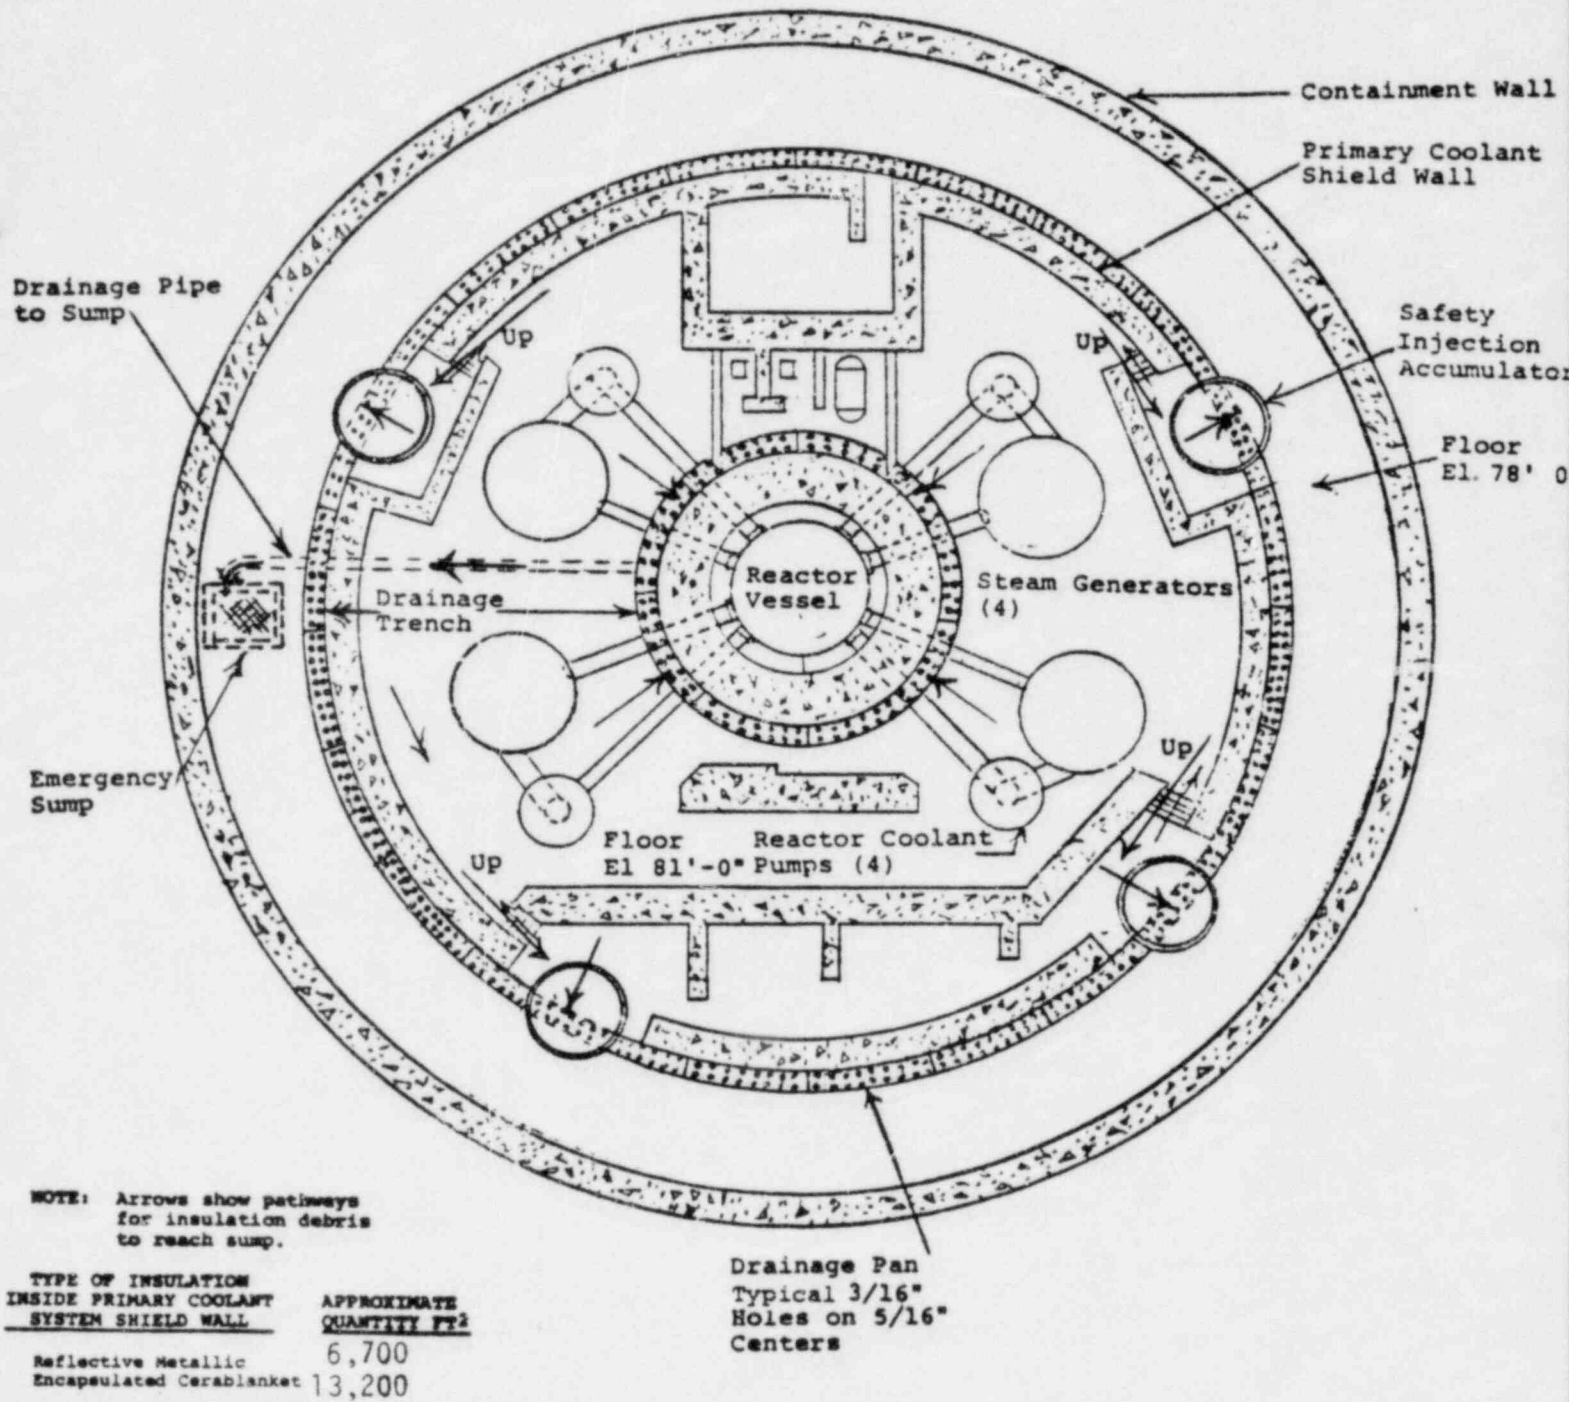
Reactor containment arrangement plan view, Salem Unit 1
